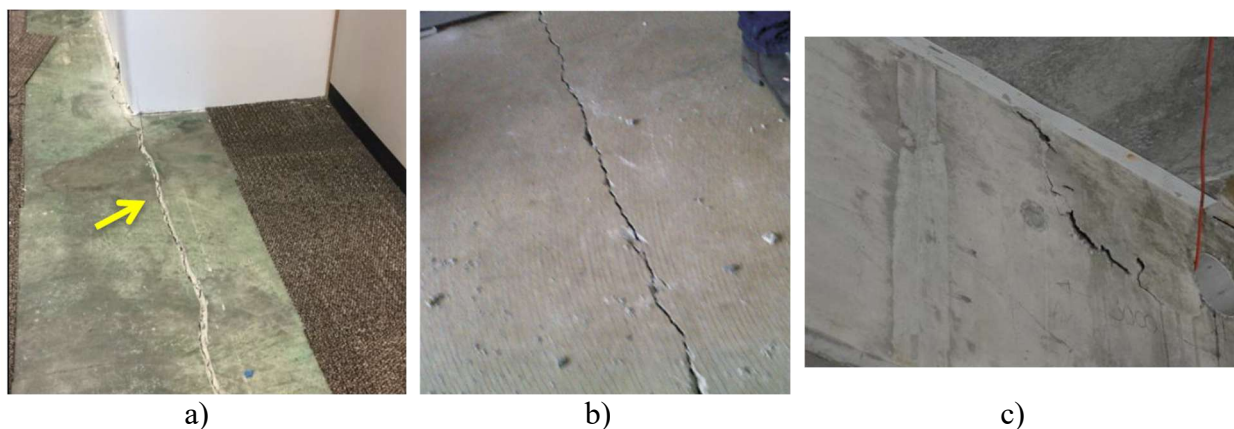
Examples of damage attributed to damage state 1: a) cracking of topping parallel to beam (Henry et al. 2017); b) cracking of slab between floor unit joints (Corney et al. 2014); c) minor spalling of primary beam (Henry et al. 2017)
